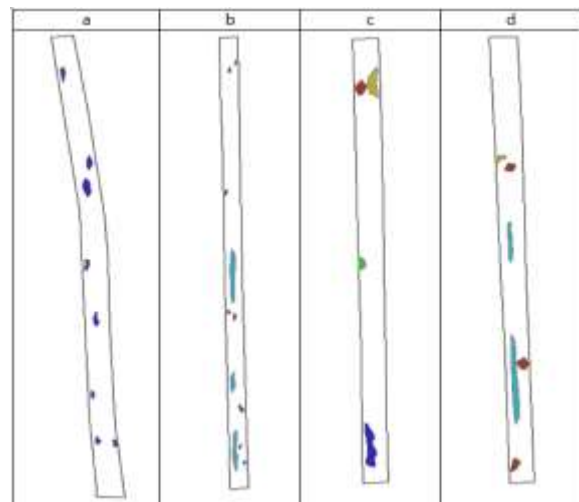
Segmented pavement distresses in section 1, Botanical Garden to Shaheed Minar
